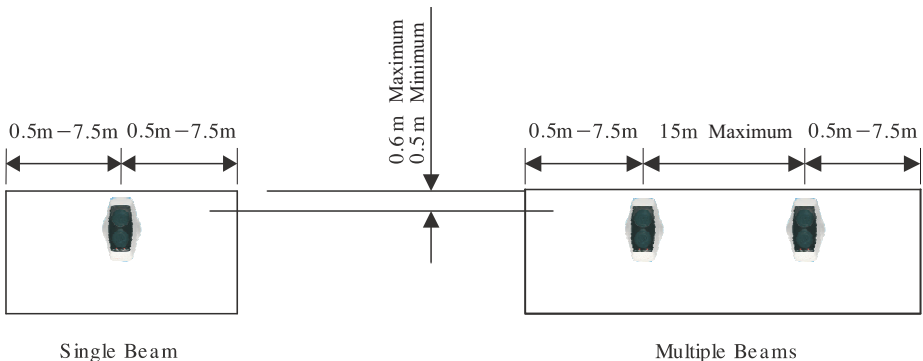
Typical installation ( Refer to graph for minimum Detector spacing)
